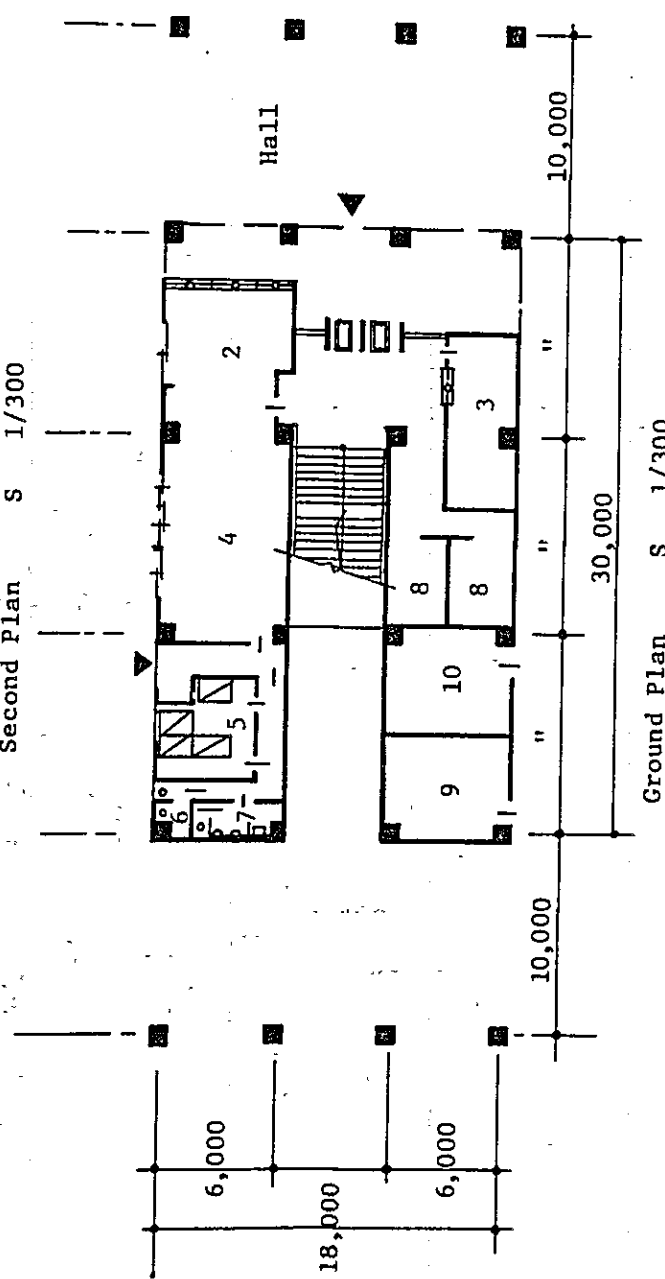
Platform Level Plan and Ground Level Plan - Kota Intan
